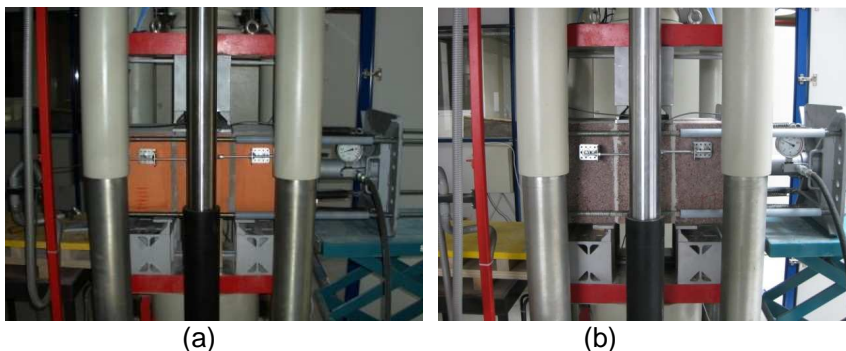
Example of shear test set-up: (a) clay and (b) lightweight concrete masonry
